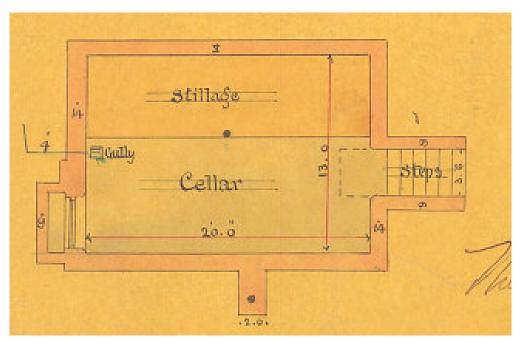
Cellar plan of Building E. Extract from 1877 architect's drawing (source: Worcester Porcelain Museum)
